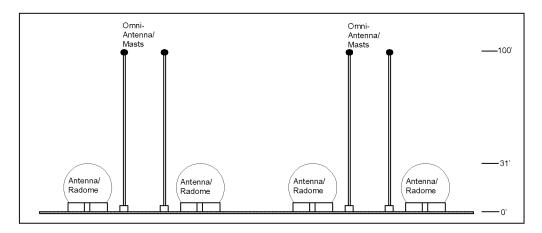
Elevation detail of antennas for proposed WR CT Site.
